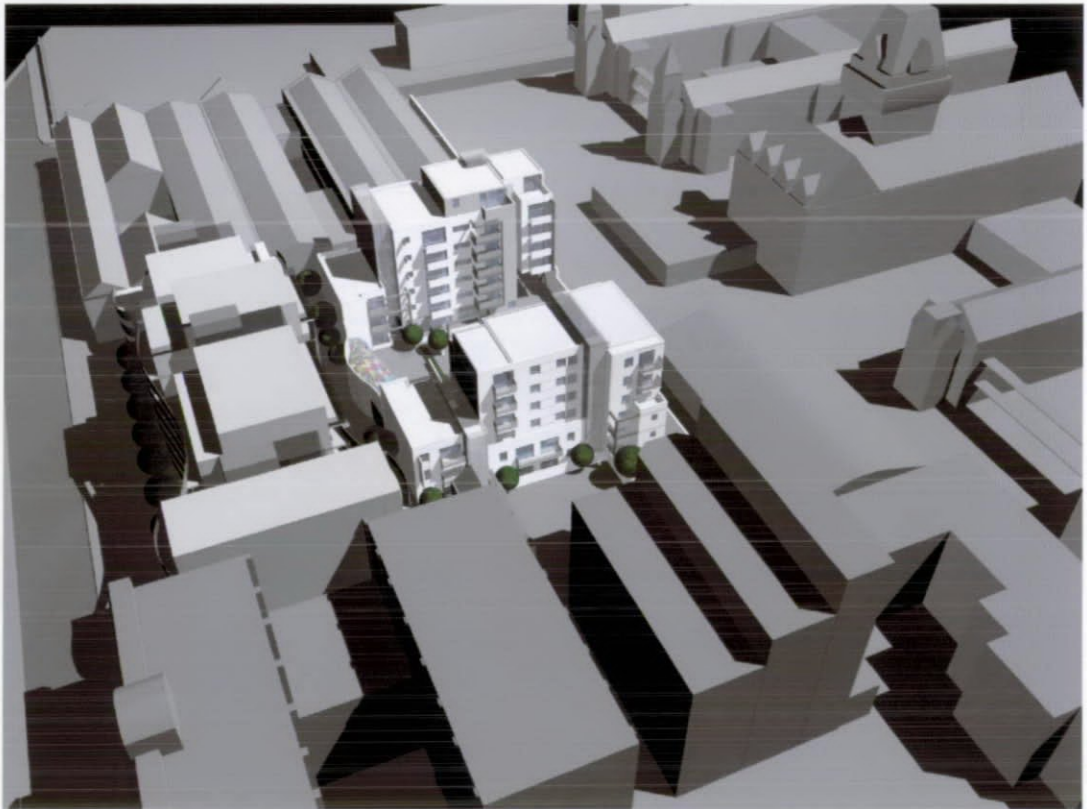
SITE MASSING MODEL - VIEW FROM WEST
